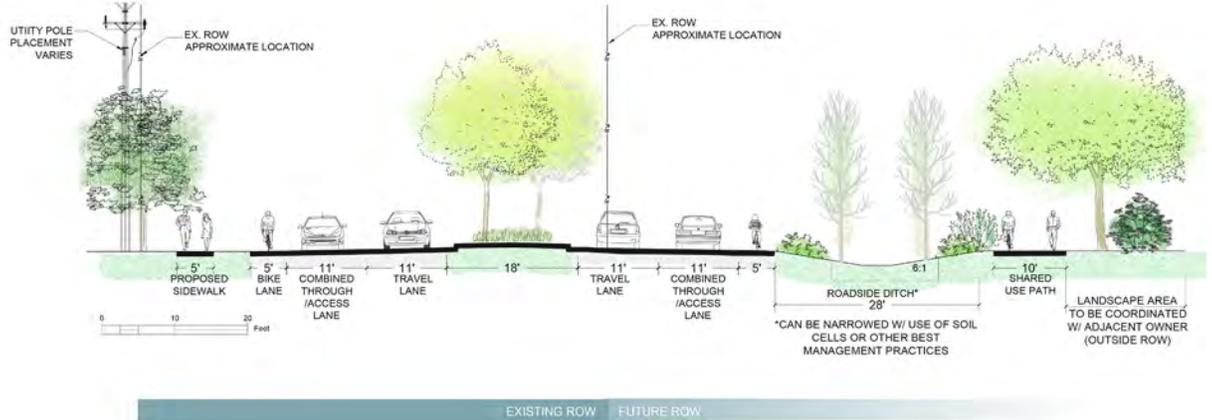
Open roadside drainage typical section (between Dartmouth and Clay)
